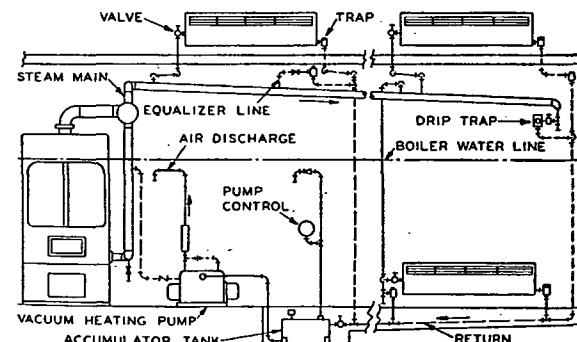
ACCUMULATOR TANK INSTALLATION IN TYPICAL TWO-PIPE VACUUM PUMP SYSTEM
